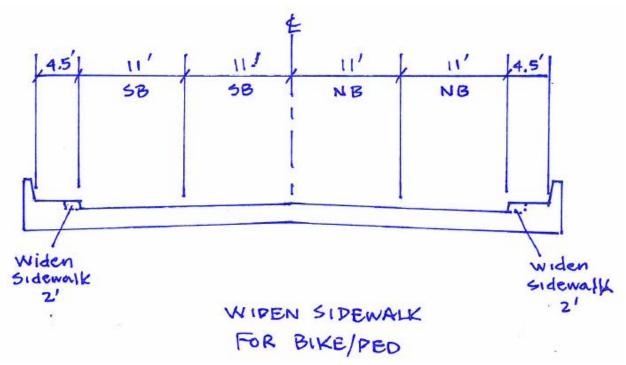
Option #3 cross-section with 11-foot travel lanes and wider sidewalks
